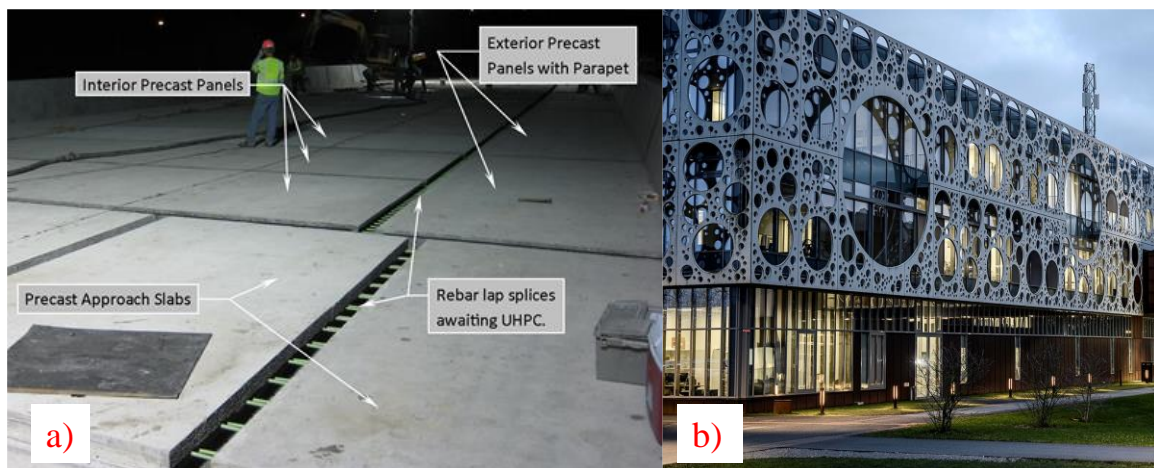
UHPC applications (a) Precast deck and connections (FHWA, Design and construction of field cast UHPC connections), (b) Architectural façade (hi-con website)
